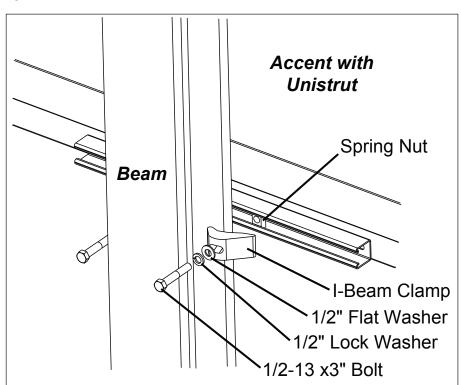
Accent Mounting with I-beam Clamps, Rear Isometric View
